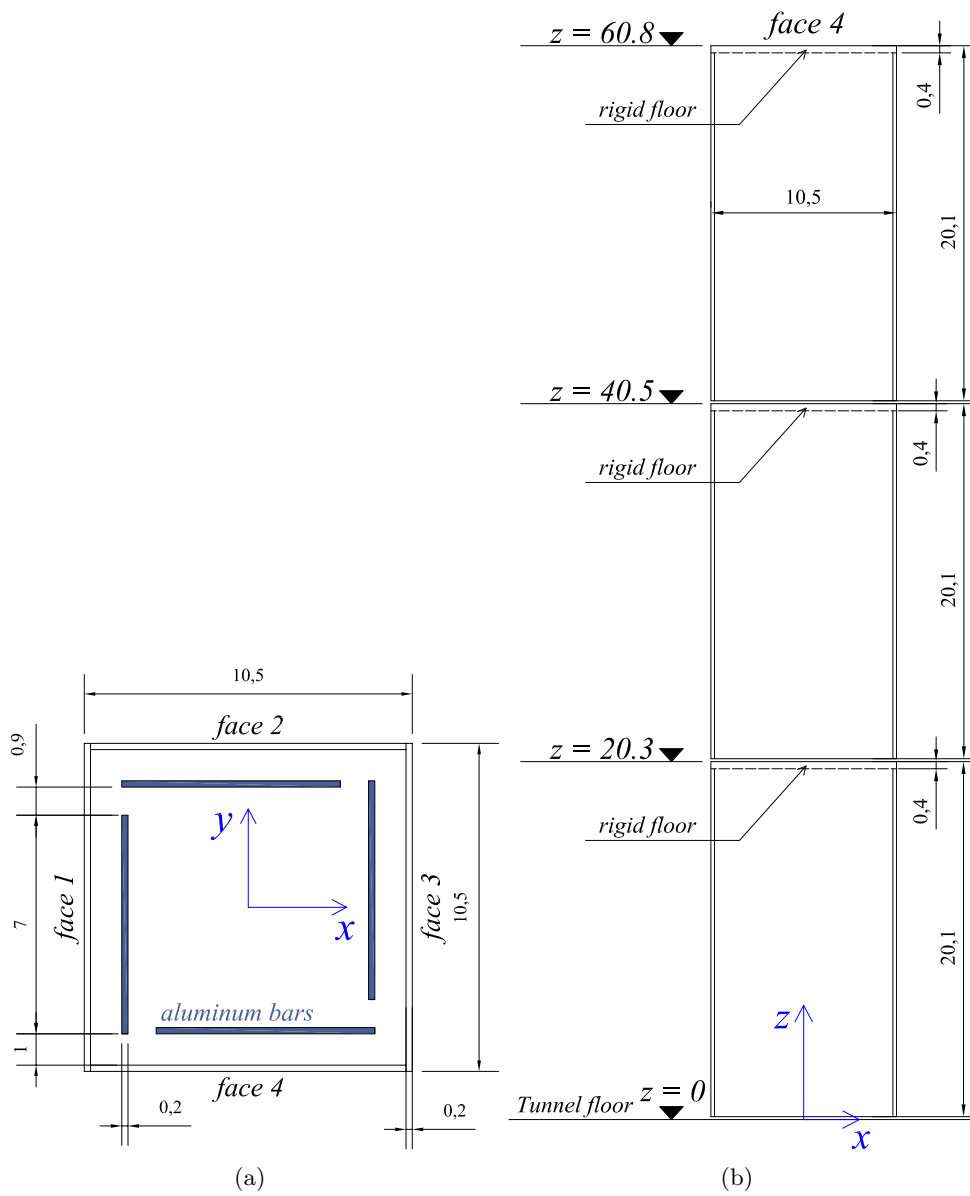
Dimensional drawing of the model: a) plan view; b) side view (face 4).
